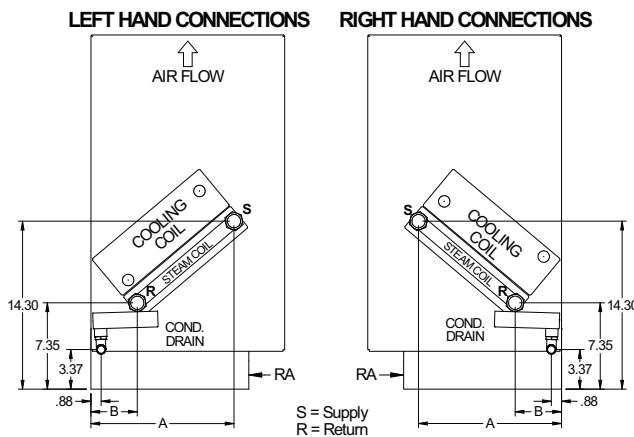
Steam Heating Coil Only or Chilled Water/DX Cooling Coil With Steam Pre-Heat Coil (No Piping Package)
